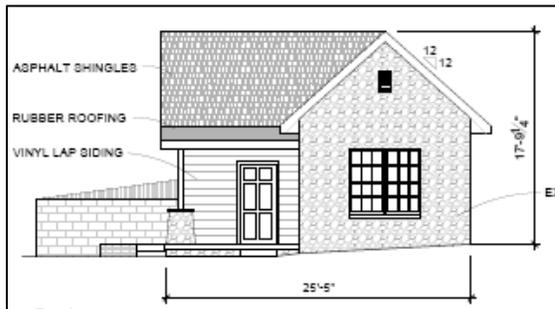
The front elevation historically, with noncontributing addition lower to the side.
